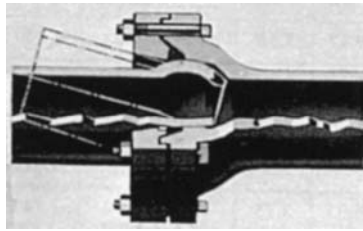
Ball-and-socket mechanical joint for cast-iron pipe.
